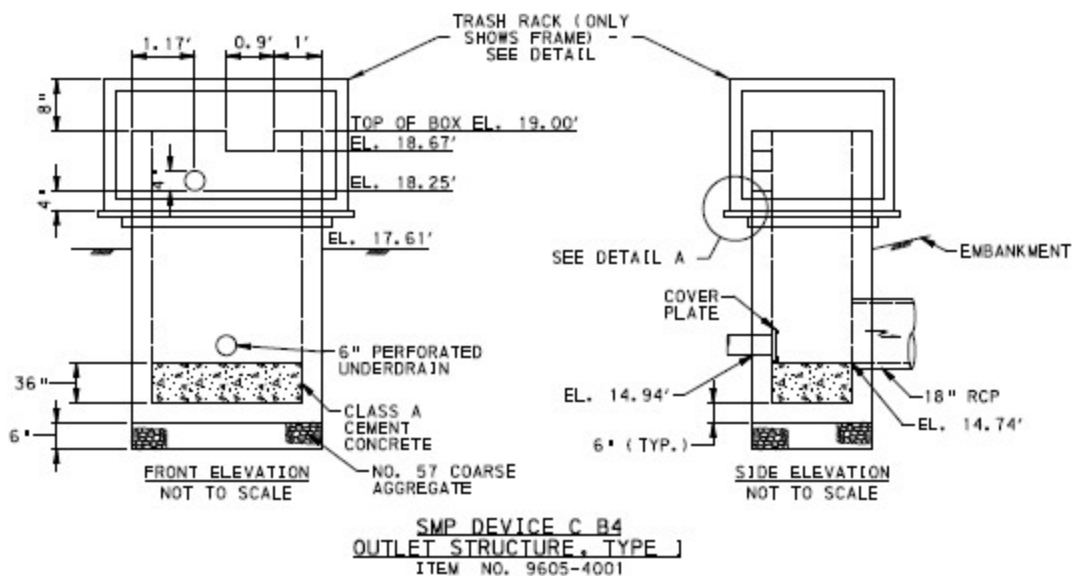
Outlet structure schematic for outlet B4 in SMP C.
